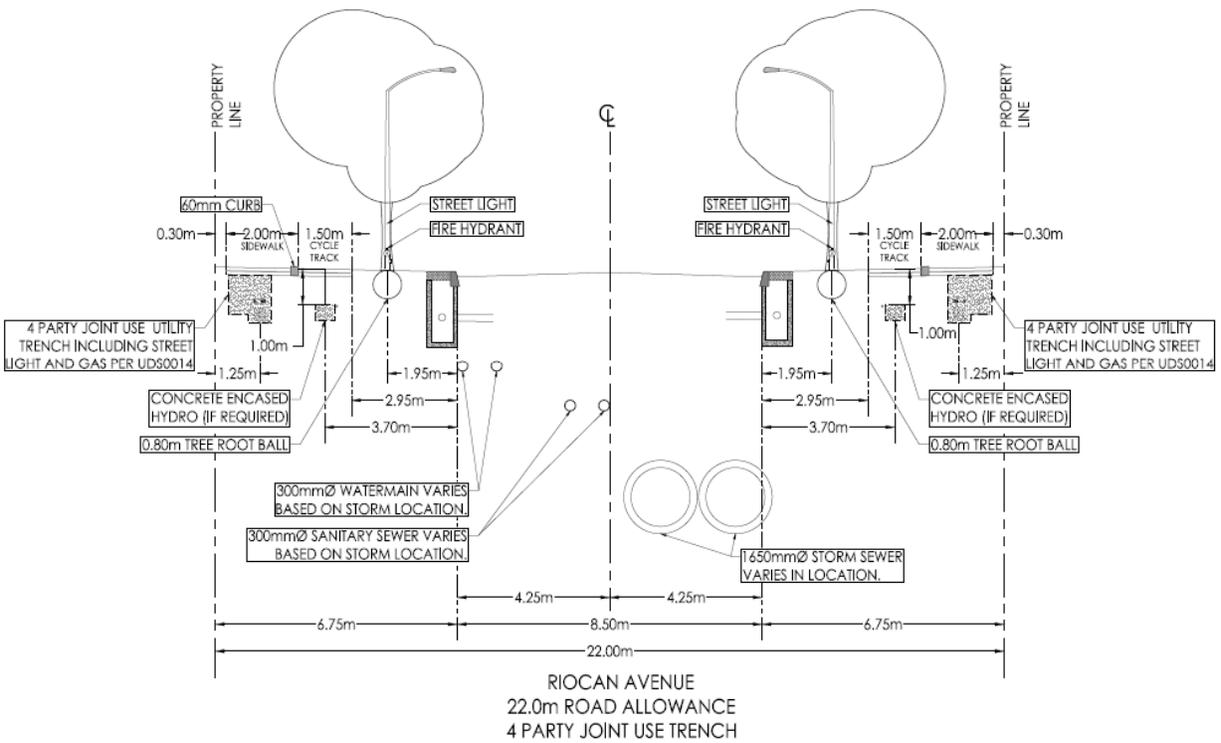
Proposed ROW Cross-Section Riocan Avenue Minto BTC Stage 2 Subdivision
